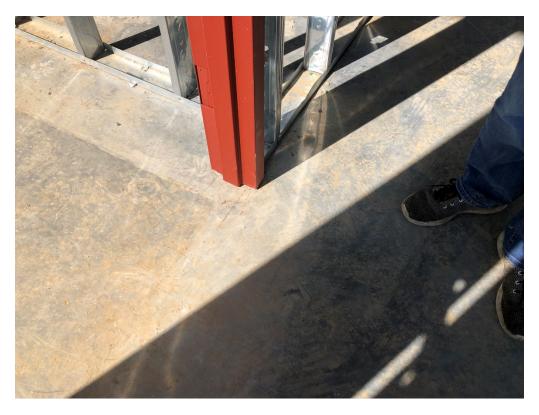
Top Floor at East Section of Building where Concrete was poured after main slab showing stress crack and floor not entirely smooth and level here
